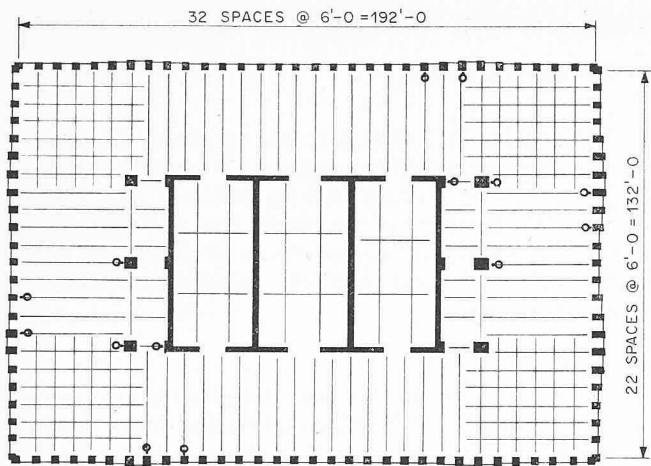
Tube-in-tube system. Very closely spaced columns and a rigid shear wall core enclosing the central service area (52-story One Shell Plaza Building in Houston)
